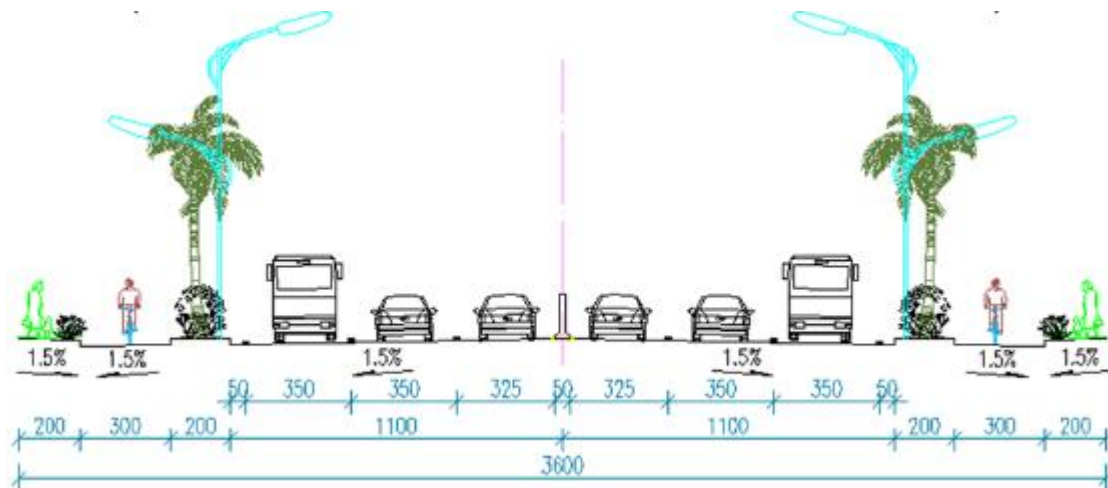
Standard Cross-section Diagram of the Urban Road Section
